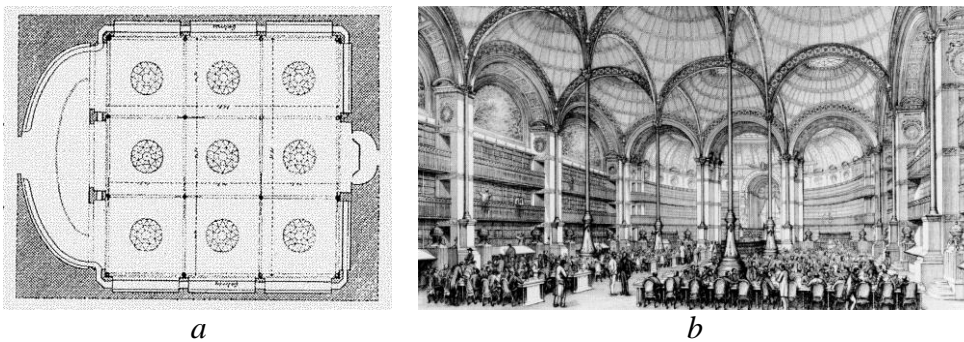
a - Bibliothèque Nationale reading room plan, b - interior view.
